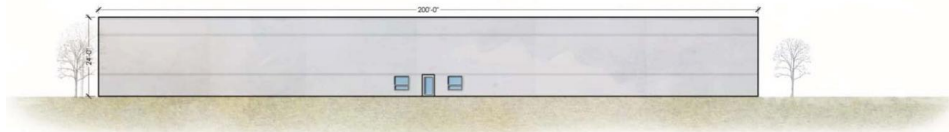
Code and net zero office/manufacturing building north elevation source: Maclay Architects
